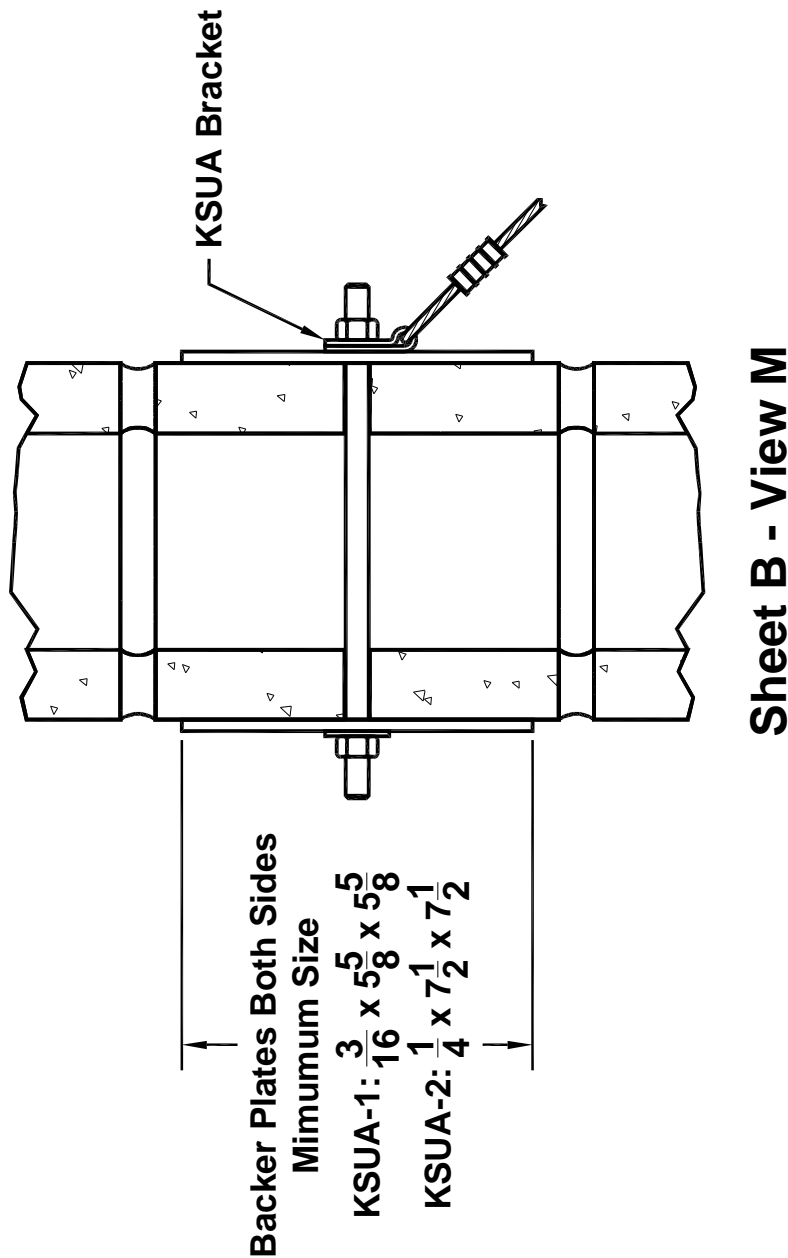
; KSUA Through Bolt Attachment to a Hollow CMU Wall
